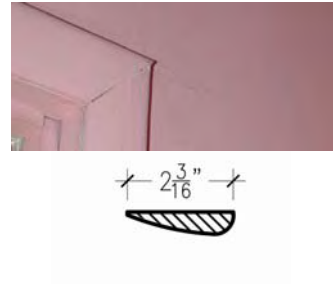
Door D209 casing molding type-9 photo and profile.
